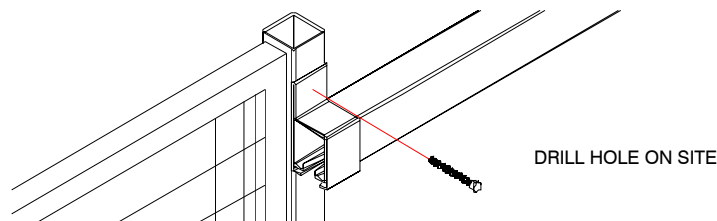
SLIDING DOOR - BRACKET-TRACK SYSTEM
